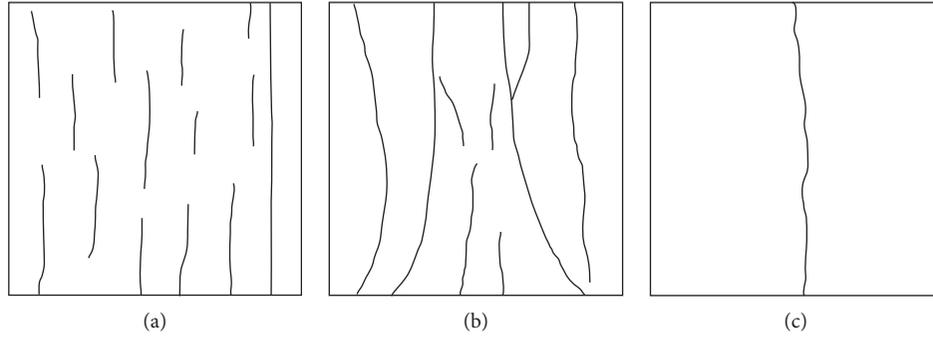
Failure modes of concrete under different loading modes. (a) Failure mode 1. (b) Failure mode 2. (c) Failure mode 3.
